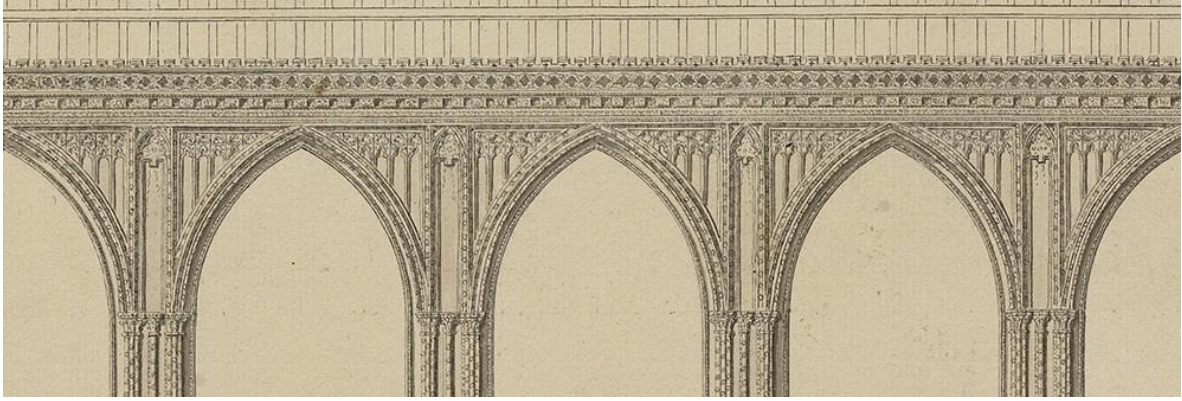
Detail of Plate 2. [*DRA 74 (Car)*].
